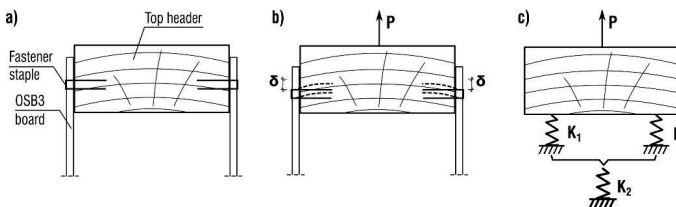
Connection of the timber top plate with sheathing boards: a) fasteners allocation in one cross-section of beam, b) deformation of staples in tests, c) spring elements describing fastening staples
